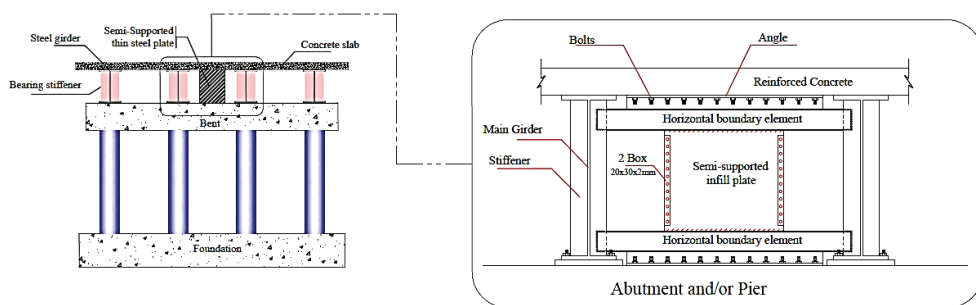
Semi-supported steel infill plate as a ductile end diaphragm.
